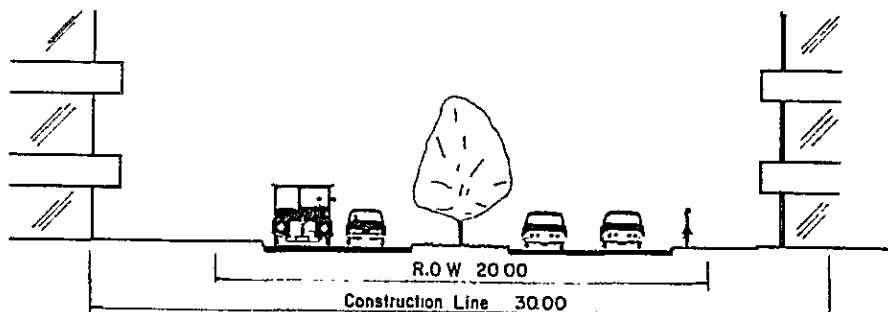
EXISTING CROSS SECTION OF VIA BRASIL
